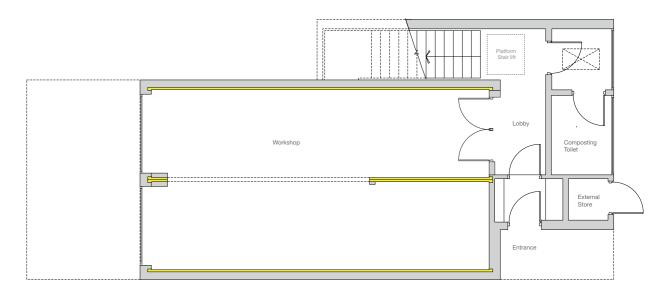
Illustrative ground floor layout of layout of Workshop / Office / Meeting Room / Toilet block
